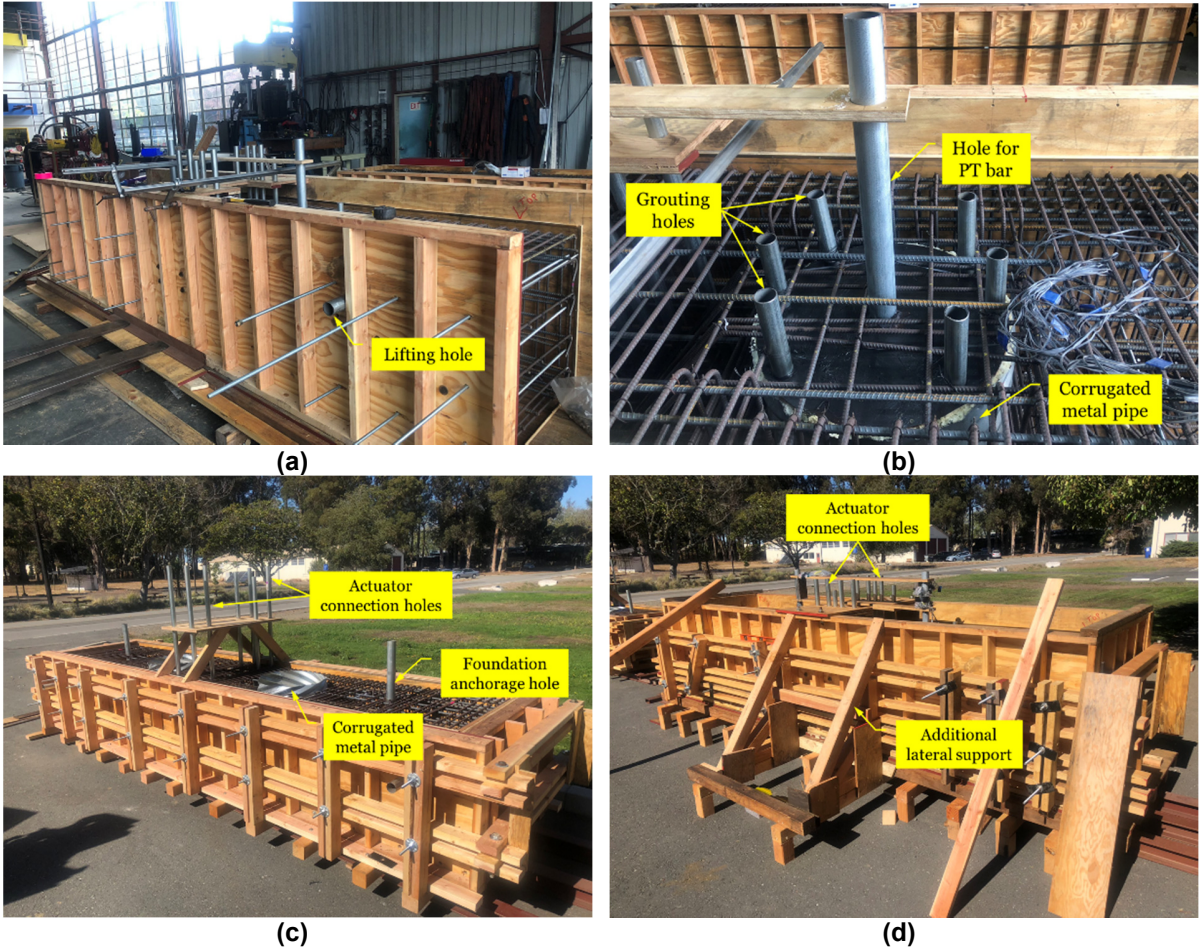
(a) Reinforcing bar cage in the formwork; (b) holes preparation for cap beam grouting and PT bars; (c) finished foundation reinforcing bar cage and formwork before concrete placing; and (d) finished cap beam reinforcing bar cage and formwork before concrete placing.
